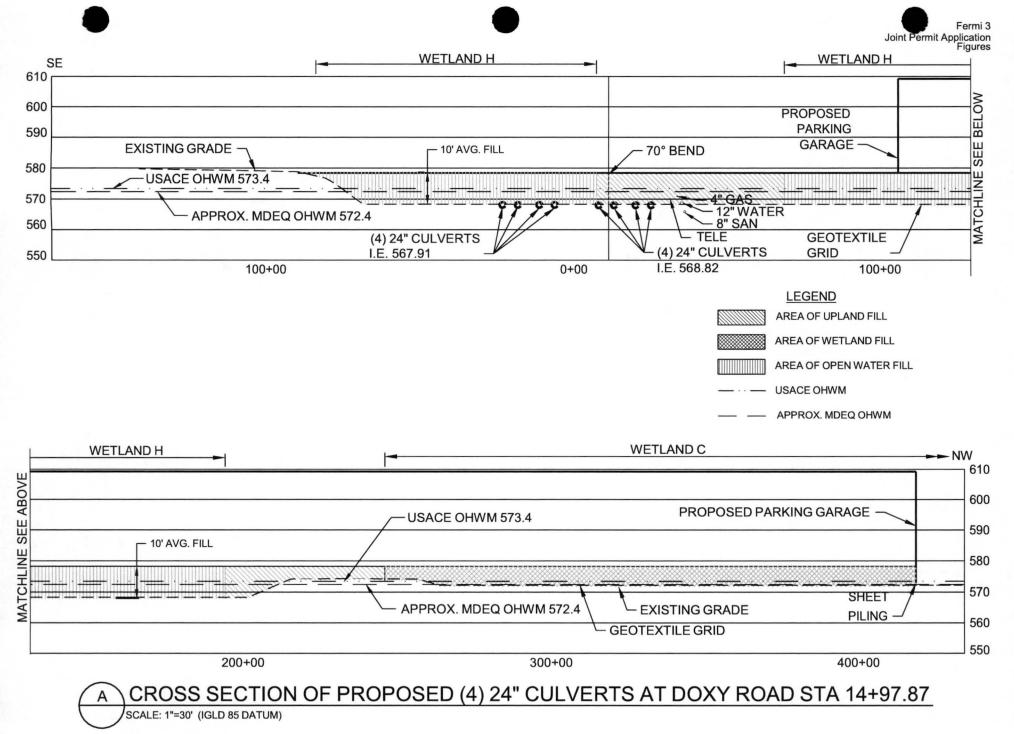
C WAREHOUSE, PAP/VIB PARKING GARAGE SECTION 'A' DETAILS
